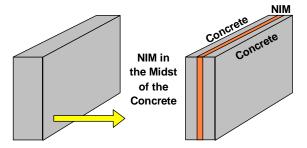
Thermal insulation with NIMs in the midst of the concrete (sandwich construction).
